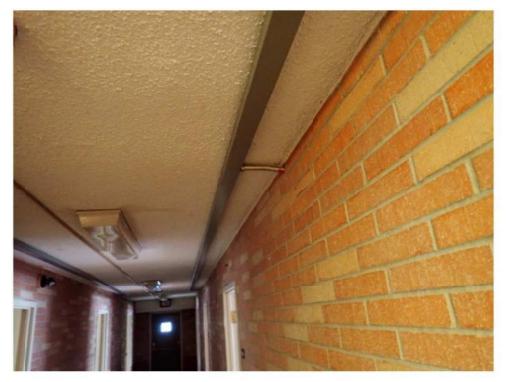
Typical Data and Emergency Wiring Installation - Hill Hall
